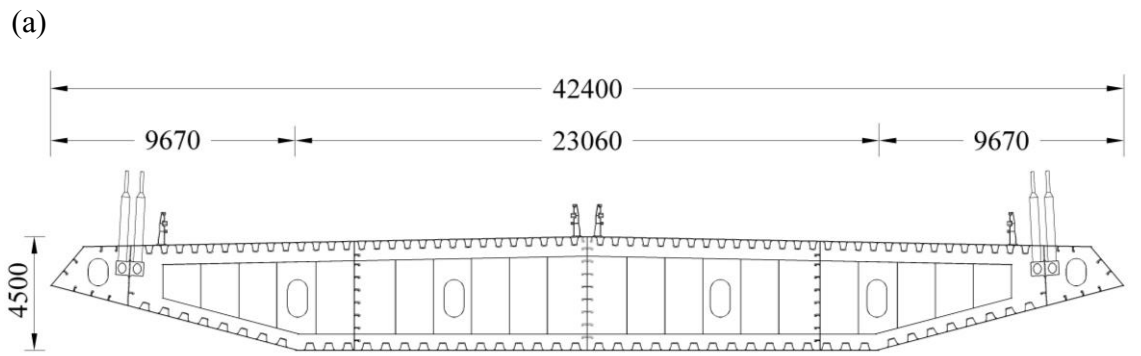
Elevation view of the bridge under examination as Shao et al. (2014).
